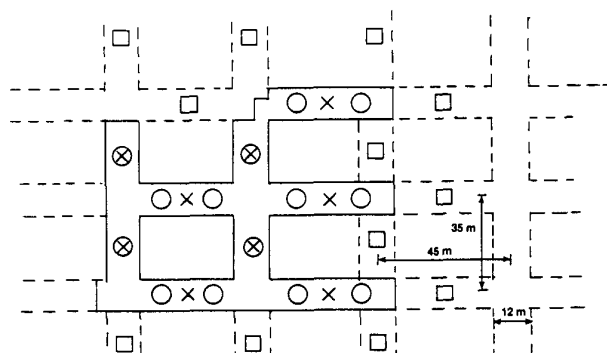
FLOOR PLAN OF MODERN BUILDING WITH 6 STORIES.
